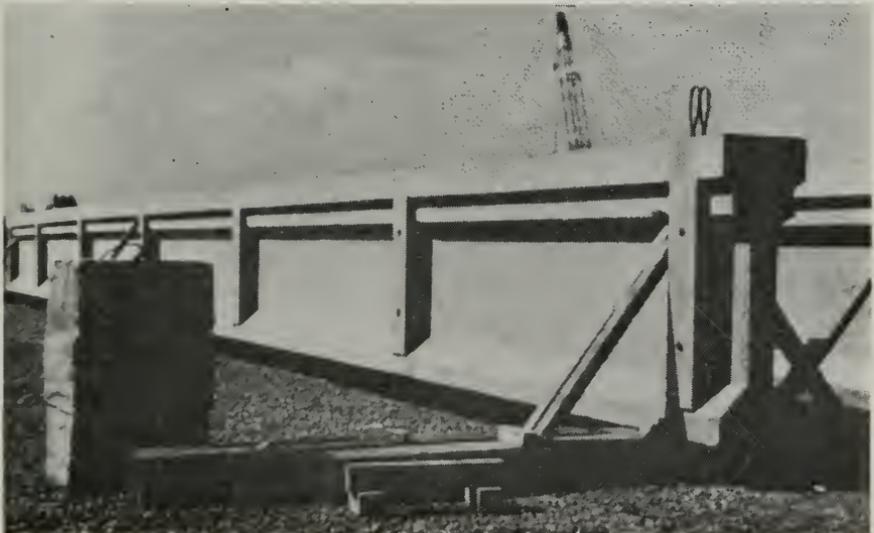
106-ft prestressed girder prior to installation in Canadian Pacific bridge near Montreal. Top and bottom flanges are of equal width eliminating need for cast-in-place deck.
